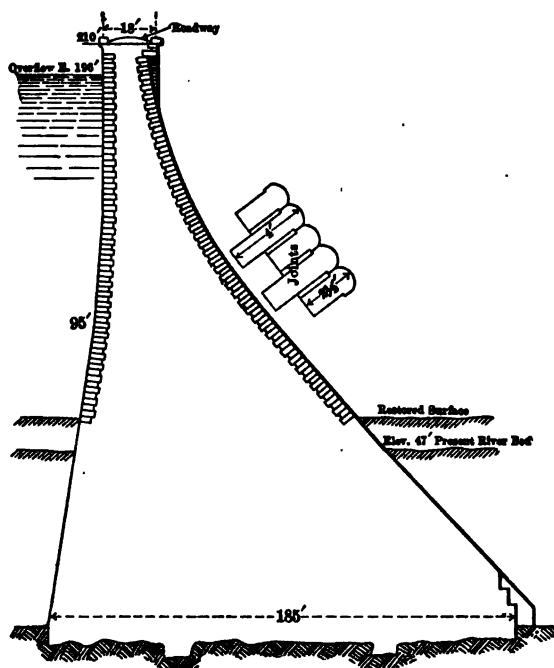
Cross-section of Masonry Dam, New Croton Dam, Cornell's.
